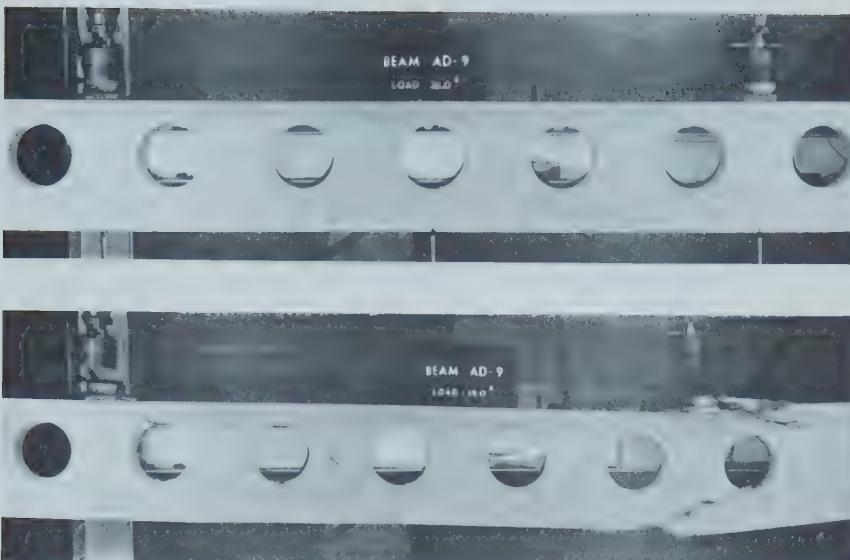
BEAM AD-9 CRACKING AND FAILURE PATTERNS
